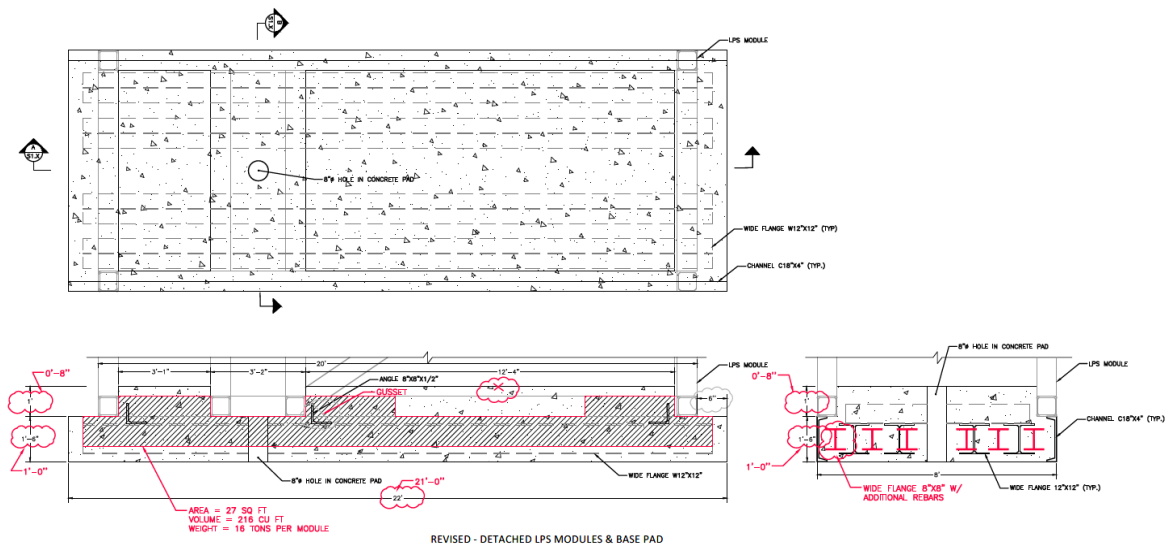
Second concept for a modular foundation – precast concrete slab with embedded steel flanges.
